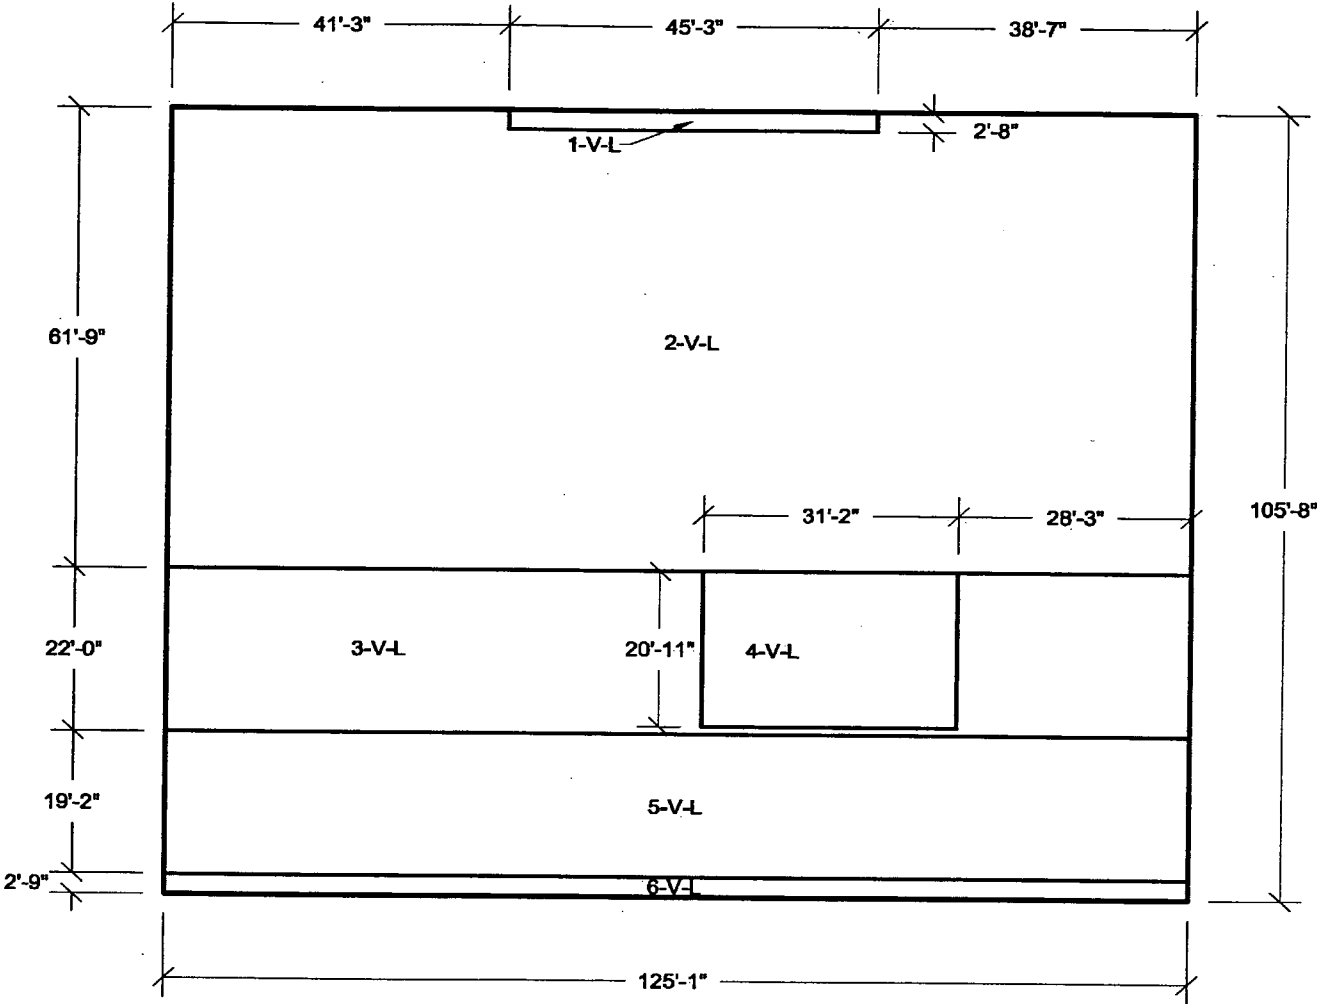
H.3-21: EAST WALL LOOKING WEST
